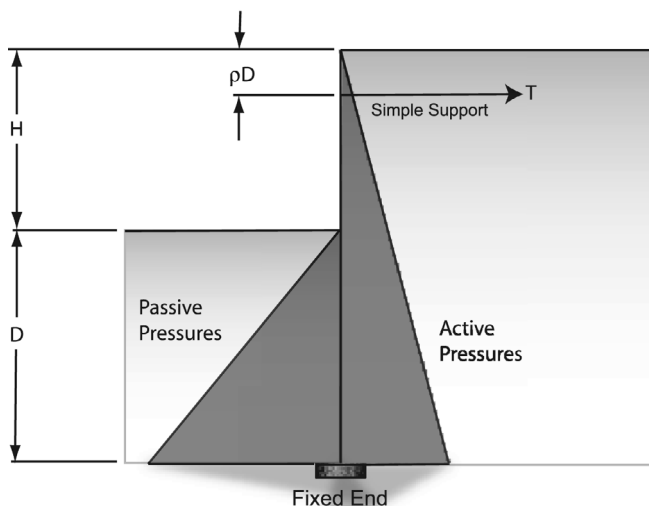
Anchored Sheet Pile Wall to Illustrate Blum’s Method
